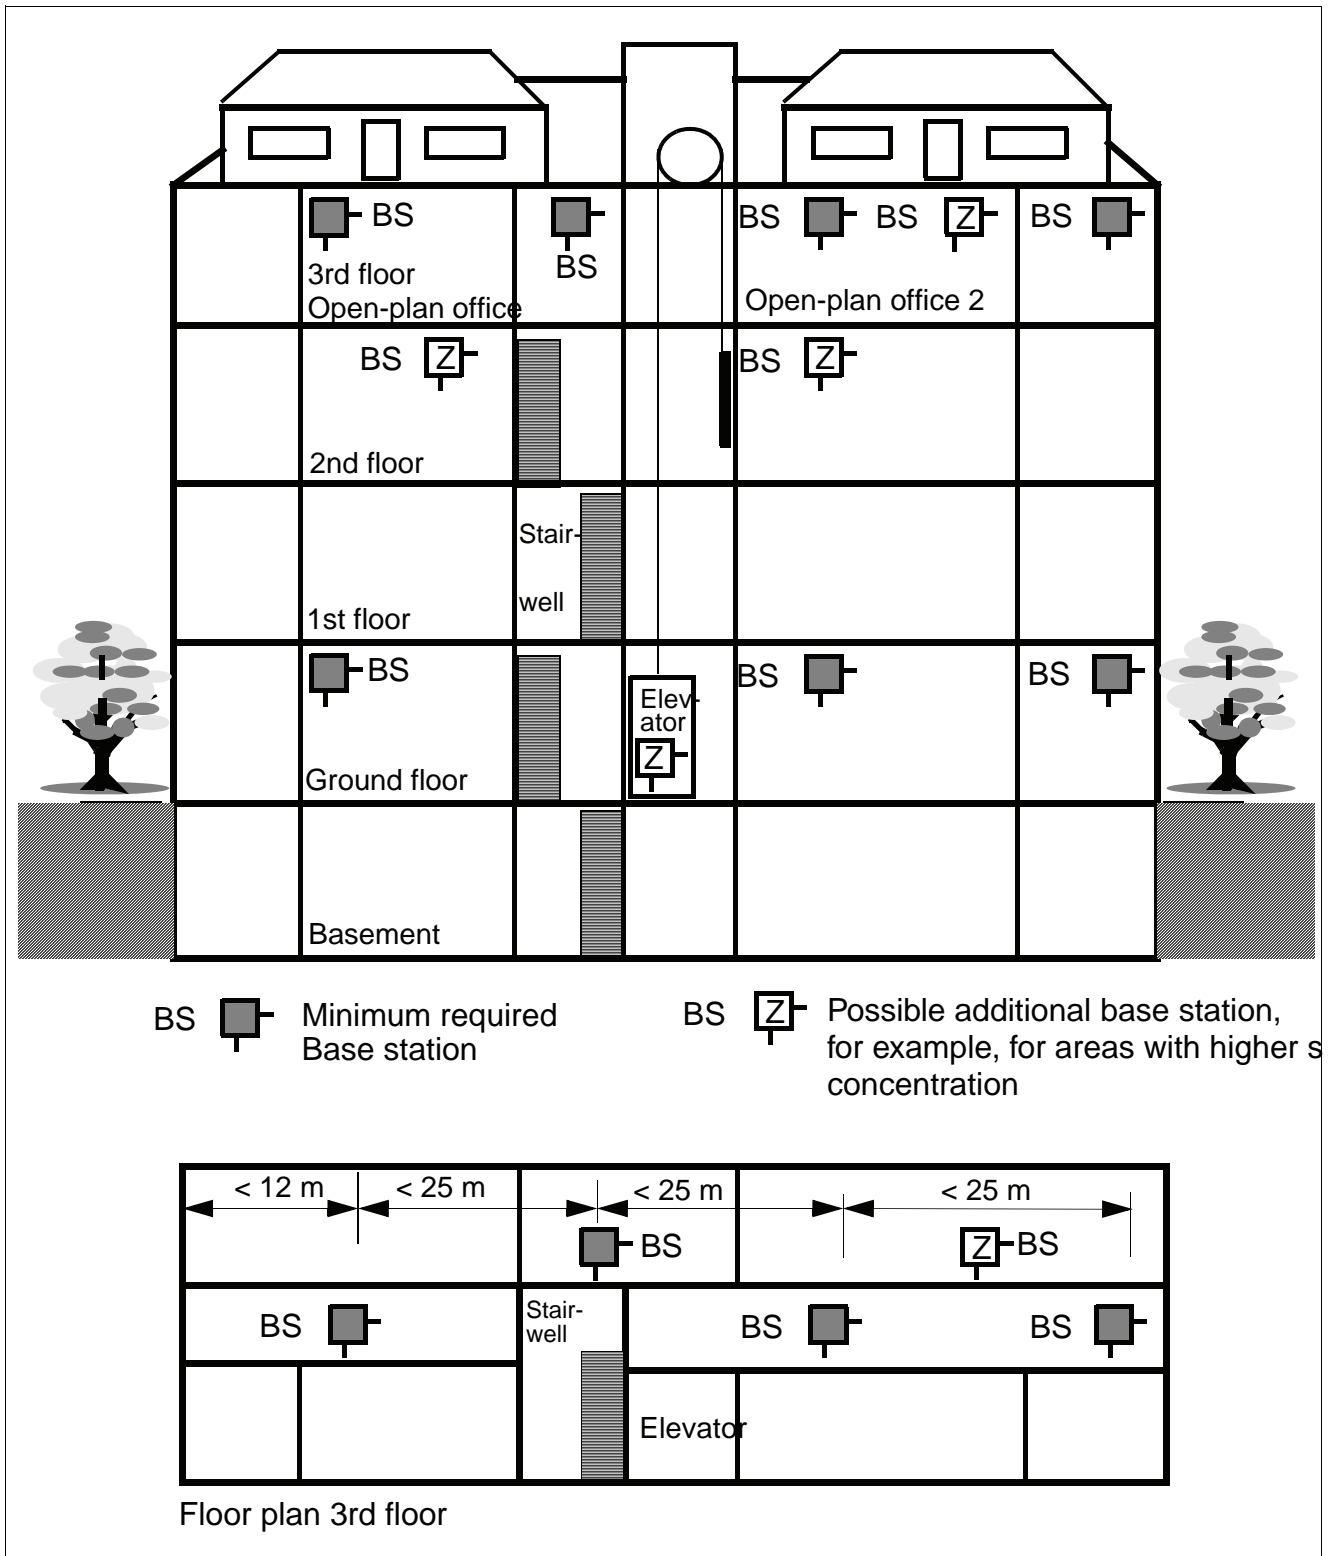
Base station distribution in interiors with concrete and steel dividing walls
